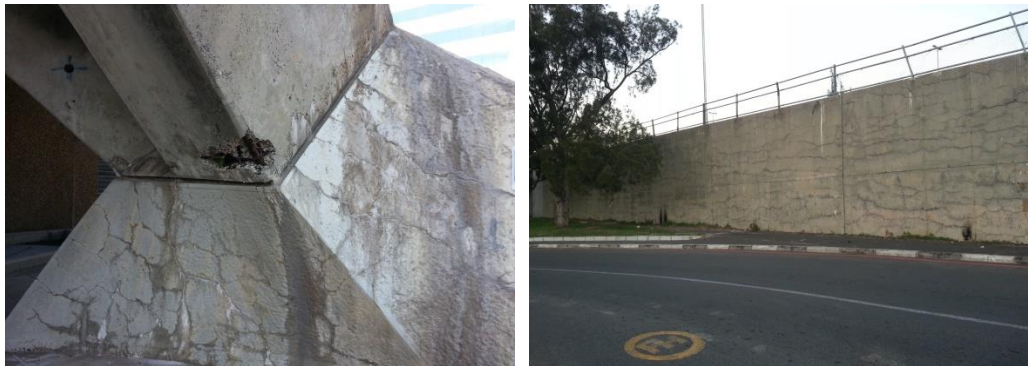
Example of ASR cracking, left: foundation plinths of Good Hope centre, Cape Town and right: Lansdowne bridge, Cape Town.
